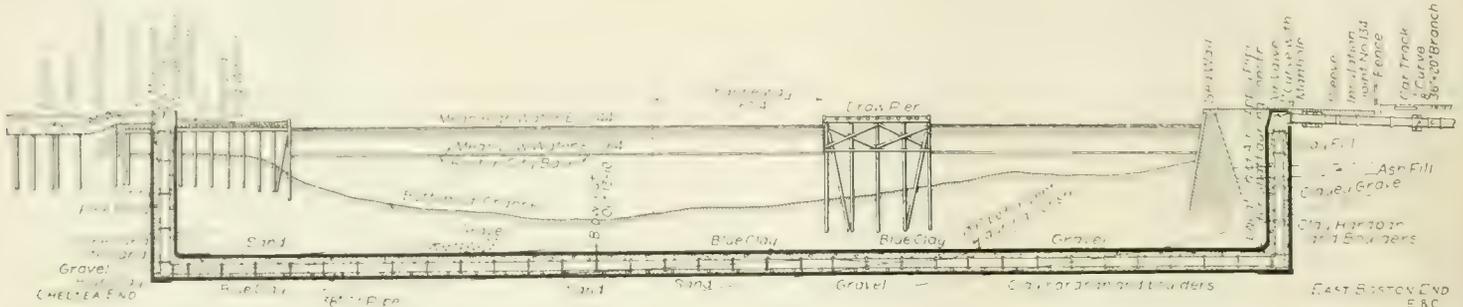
Longitudinal Section Through Water Tunnel Under Chelsea Creek, at Chelsea Street Bridge, Boston, Mass.
